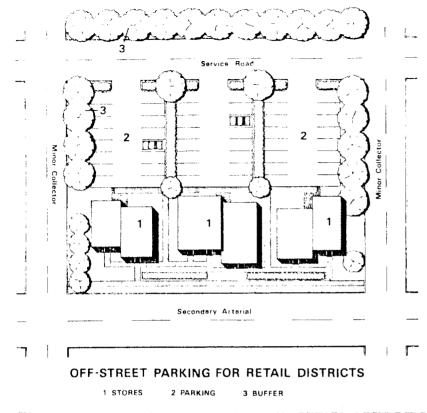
OFF-STREET PARKING FOR RETAIL DISTRICTS
